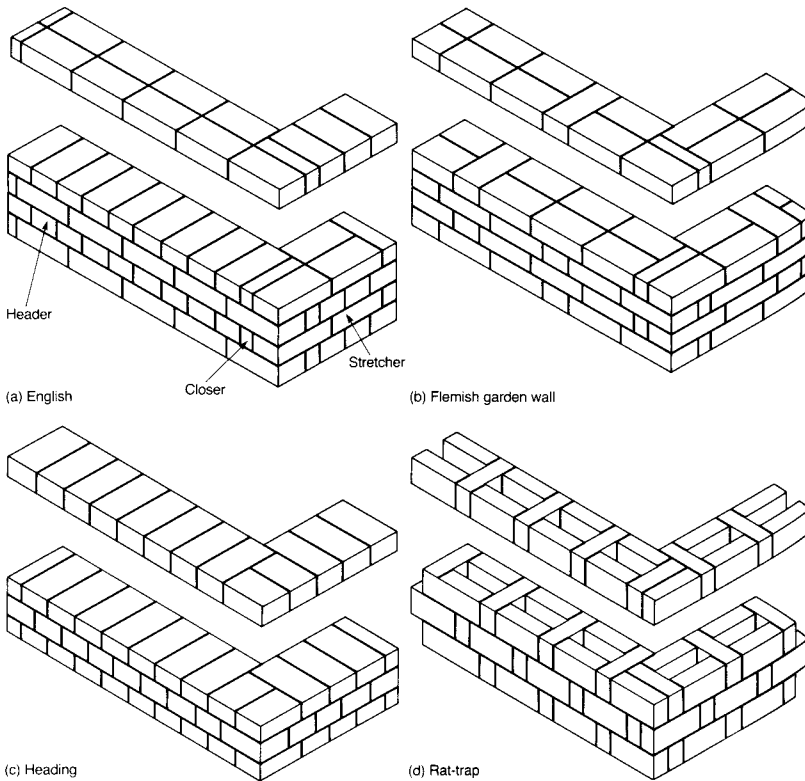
Bonded wall types: (a) English bonded wall; (b) Flemish garden wall; (c) Heading bond; (d) Rat-trap bond.
